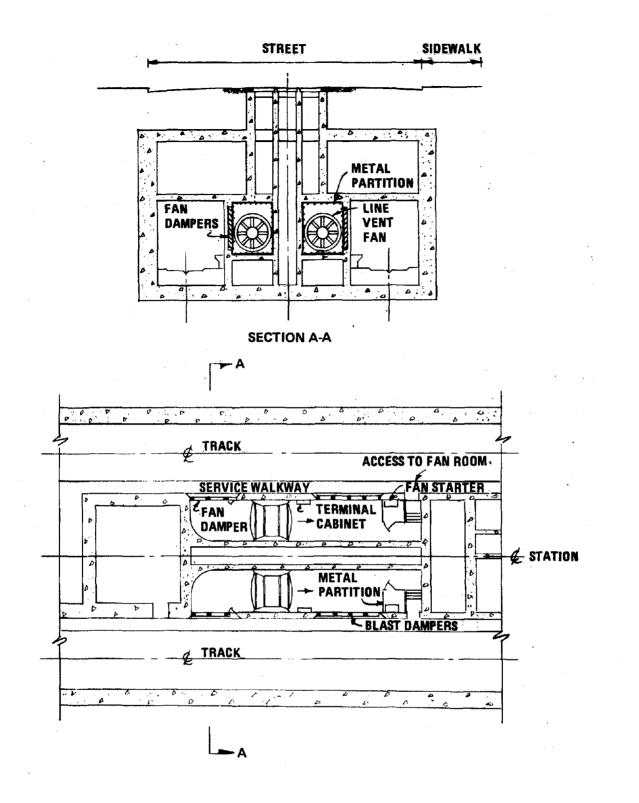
VENTILATION SYSTEM ARRANGEMENT - TWIN BOX SECTION
